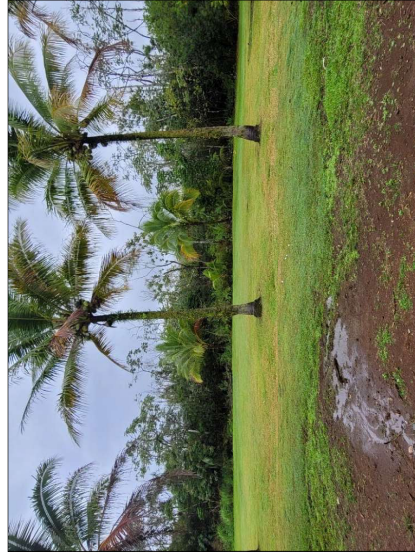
Photo overlooking the open, graded perimeter area in the southwest corner of the property outside the plant security fence, where a future warehouse building is planned. view to south
